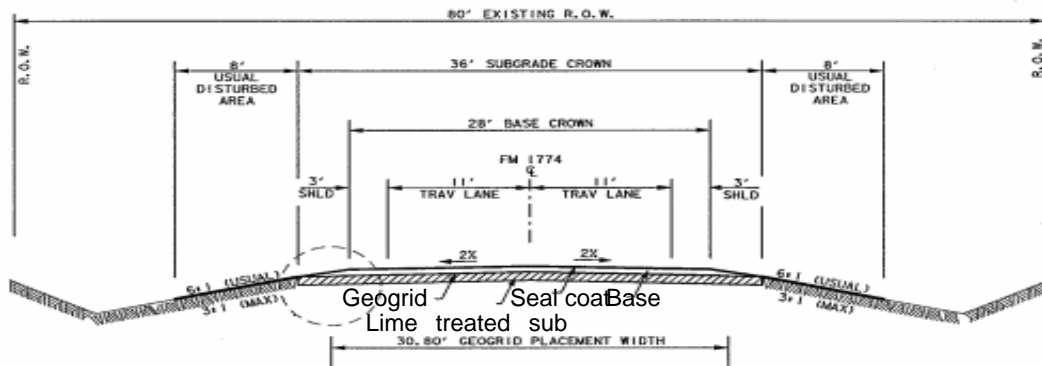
Typical geogrid reinforced pavement section at FM 1774
